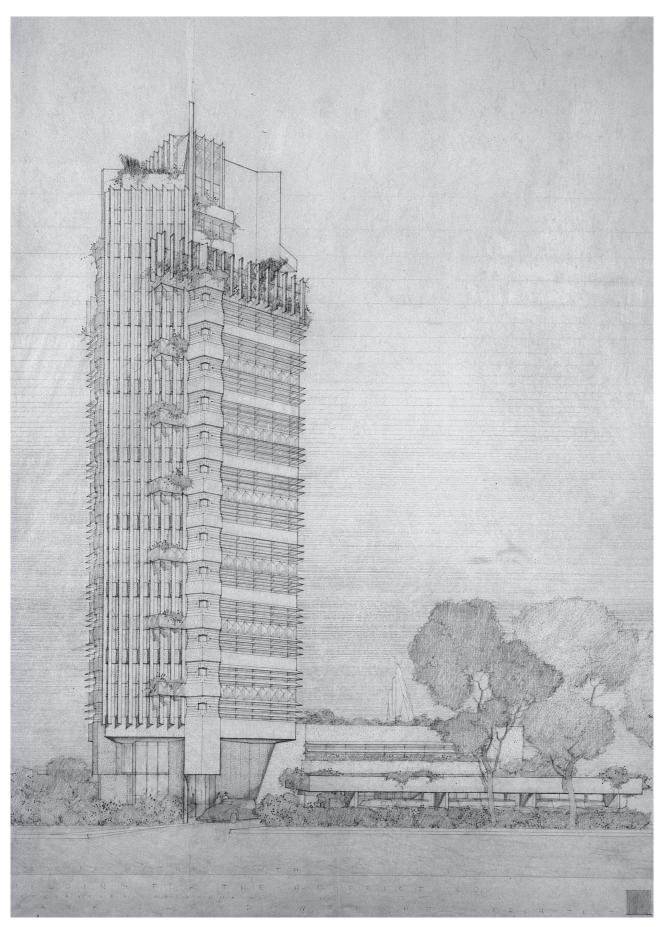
Price Tower, Bartlesville, Oklahoma, 1952–1956. Perspective drawing, 30 September 1952. Pencil and color pencil on tracing paper, 43x34. FLWF 5215.004. Copyright © 2011 The Frank Lloyd Wright Foundation, Taliesin West, Scottsdale, AZ.
